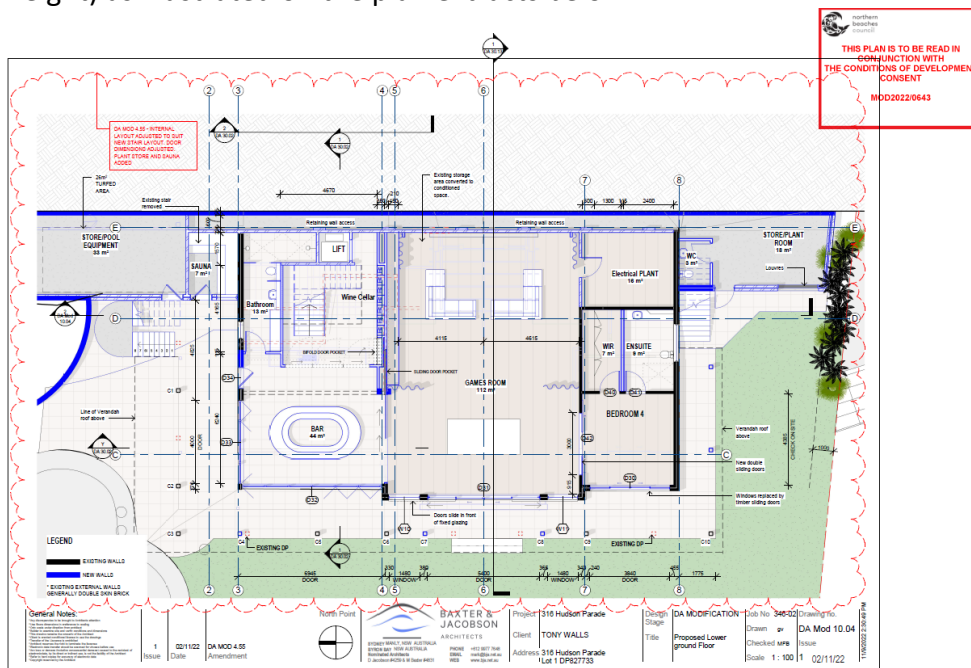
Plan Extract: Modified Lower Ground Floor Plan.
